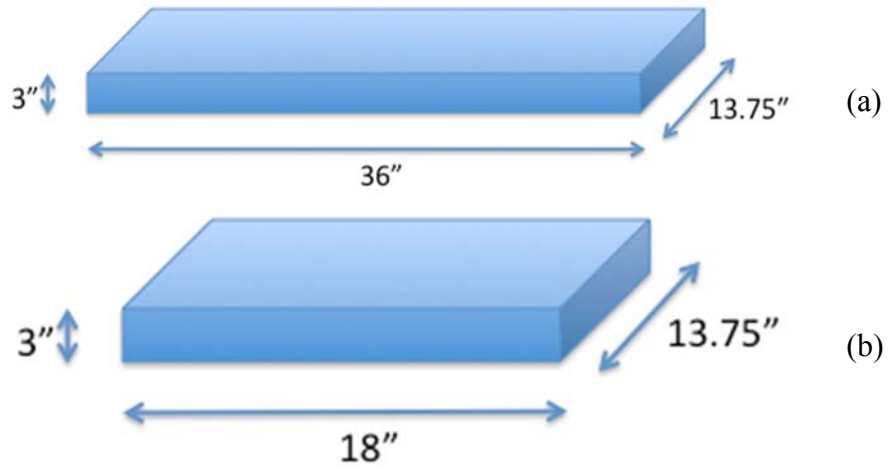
Dimensions of slab specimens: (a) full size; (b) half size
